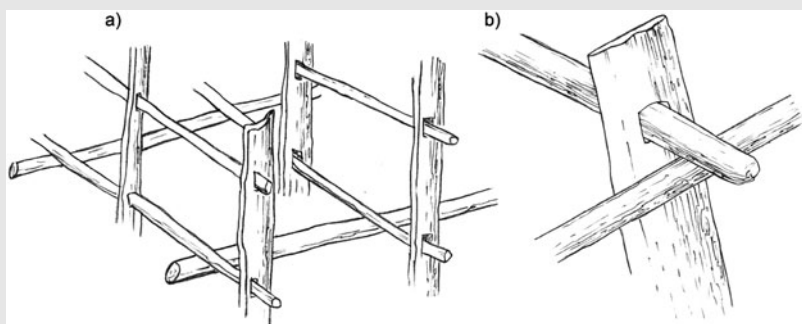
The *Stelzbau* building technique. (Drawings: Olenka Dmytryk)
